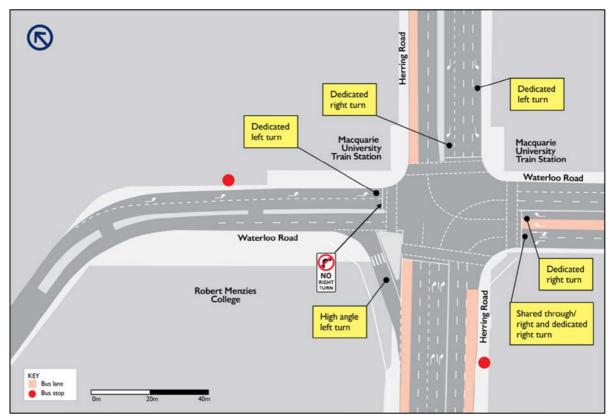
Proposed changes at the intersection of Herring Road and Waterfloo Road
